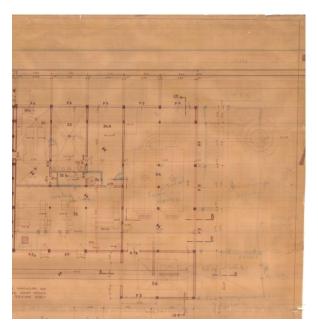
The ground floor plan of the boiler house, Egli (Source: TTA Archive)
